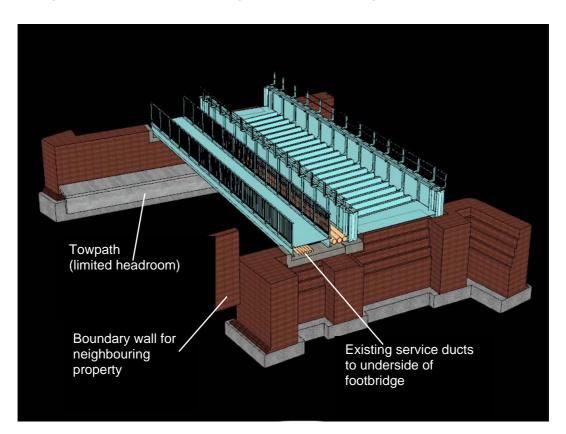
Sheepwash Bridge, isometric view on existing decks 4 and 5
